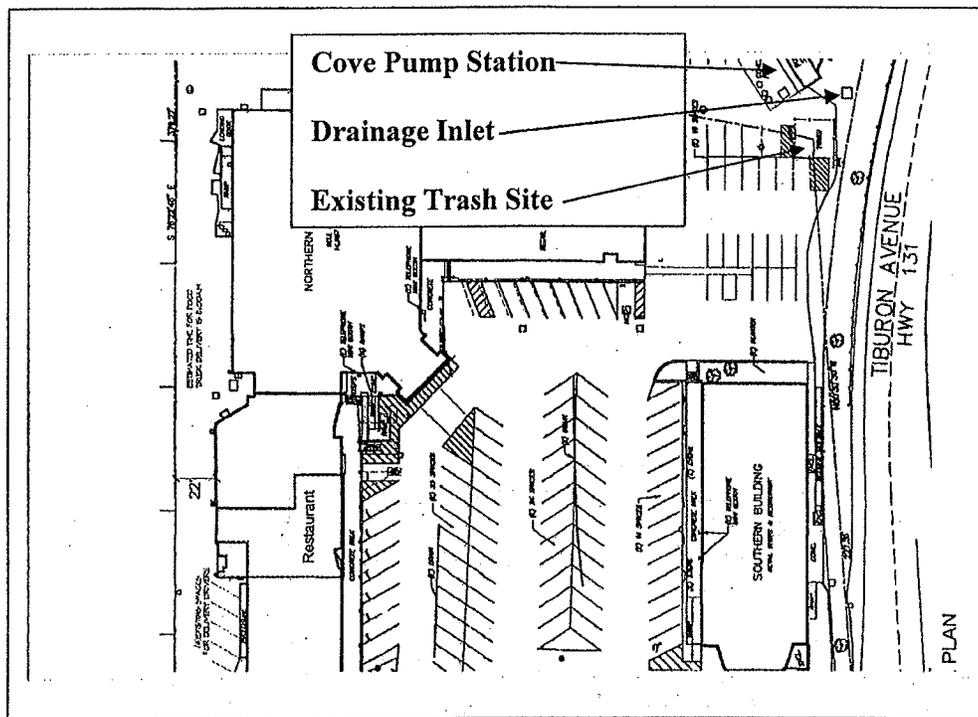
Location of Cove Stormwater Pump Station and Drainage Inlet
